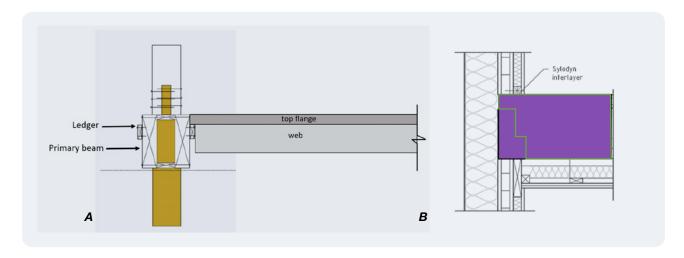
Example of connection of ribbed deck floor cassette into main structure (a) supported by primary beams, adapted from WoodSolutions Technical Design Guide #26 (Forsythe 2015) (b) supported on CLT load-bearing walls (Jarnerö, Brandt & Olsson 2015).
